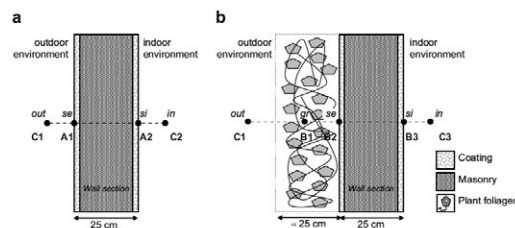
Characteristic sections of (a) a bare and (b) a plant-covered wall surface defining the position of the sensors.
